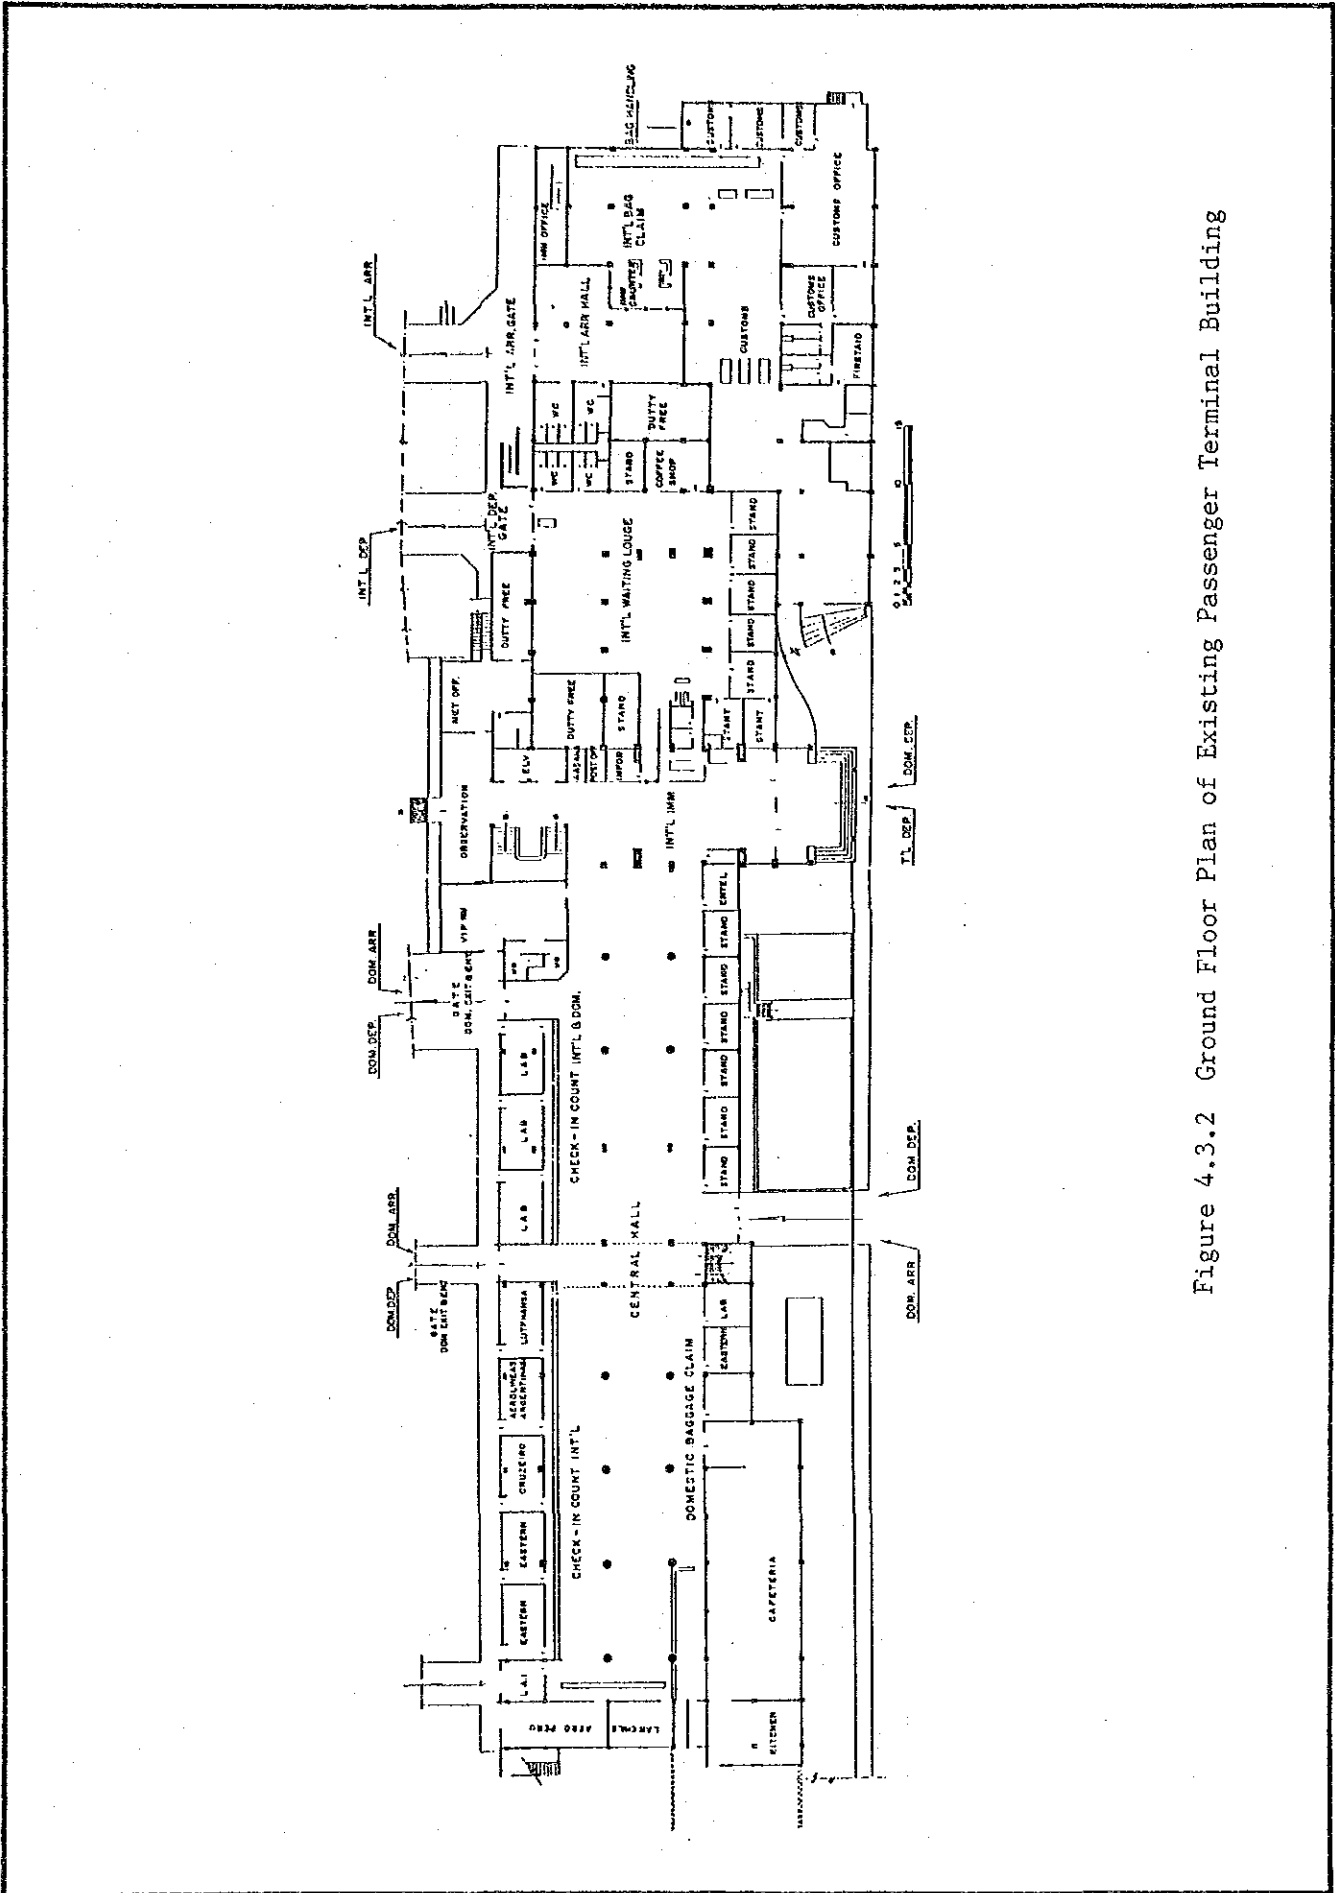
Ground Floor Plan of Existing Passenger Terminal Building
